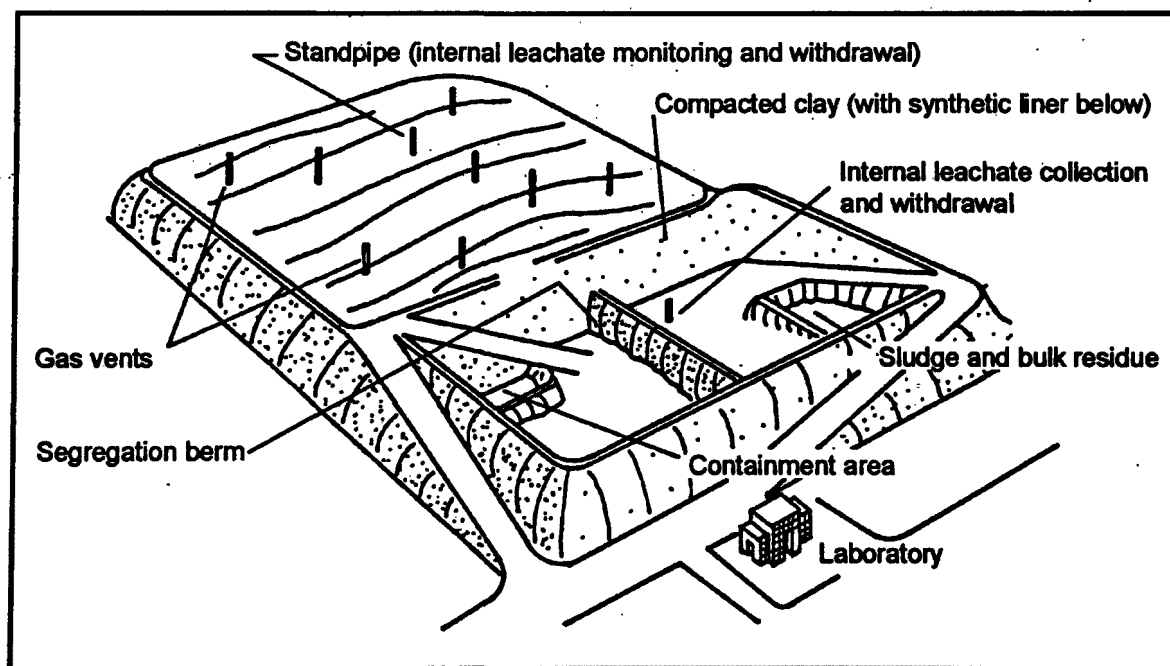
Illustration of a Hazardous Waste Landfill Facility
